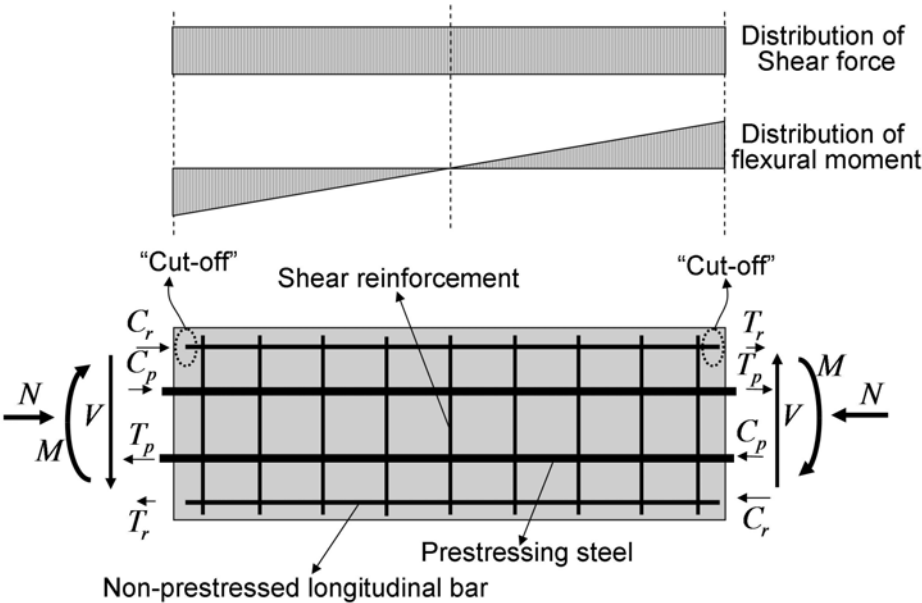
Post-tensioned precast concrete member subjected to pure shear
